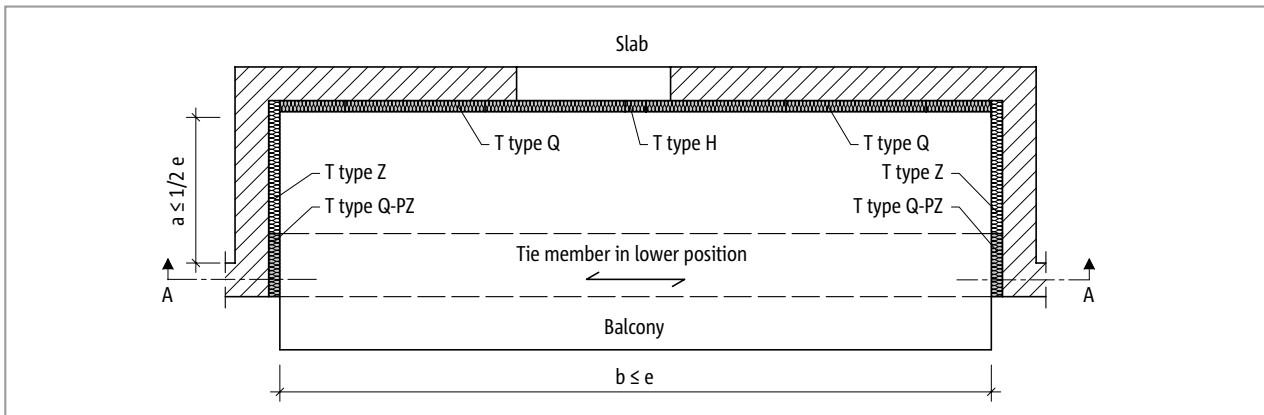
Schöck Isokorb® T type Q-PZ: Layout of recessed balcony - symmetrical
